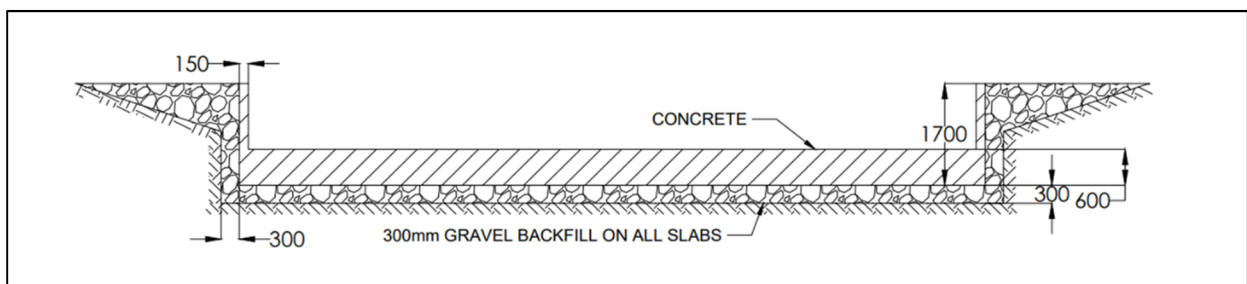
Exemplary profile view of gravel reinforcement around a concrete slab.
